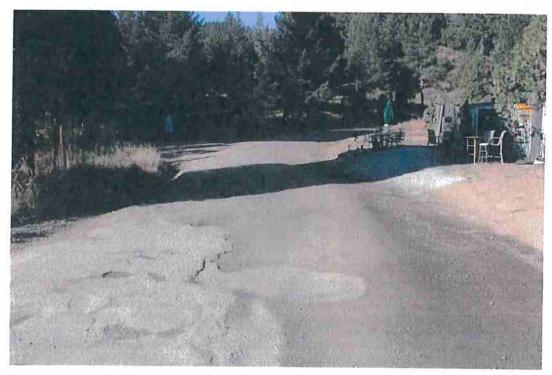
Mile 4.0: 15-ft road width with 2-ft shoulders. Broken pavement edges make segment more treacherous.
